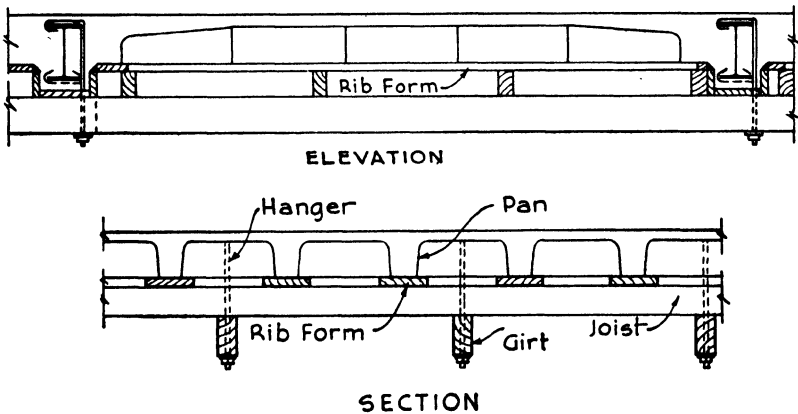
Forms for Pan Ribbed Slab in Steel Frame.
